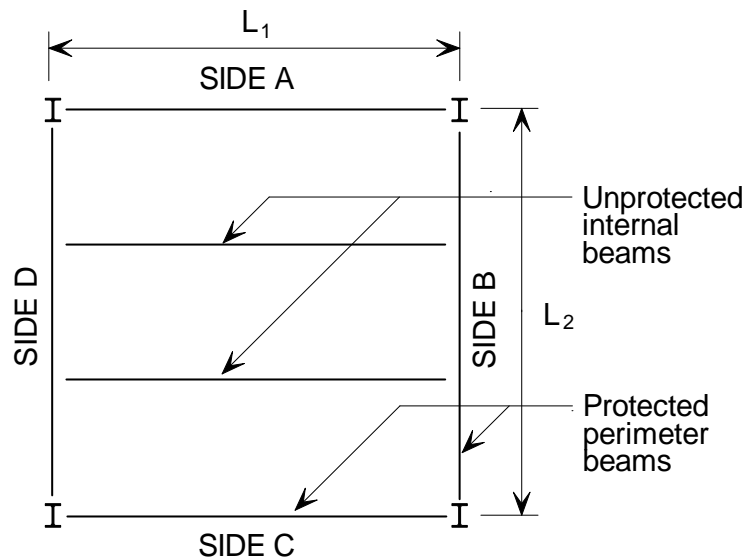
Definition of span 1 (L_1) and span 2 (L_2) and the beam layout for a floor design zone in a building requiring fire resistance of 60 minutes or more.
